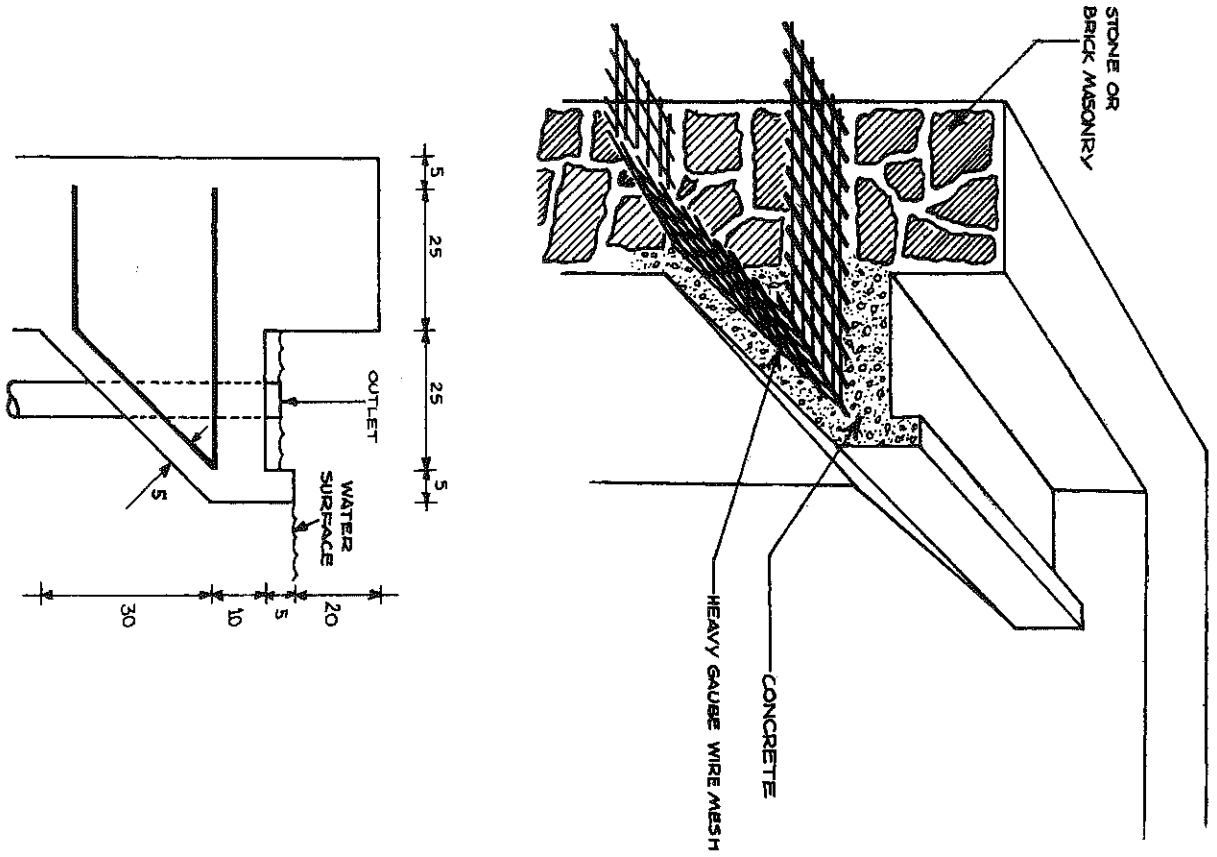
DETAILS OF COLLECTION GUTTER
